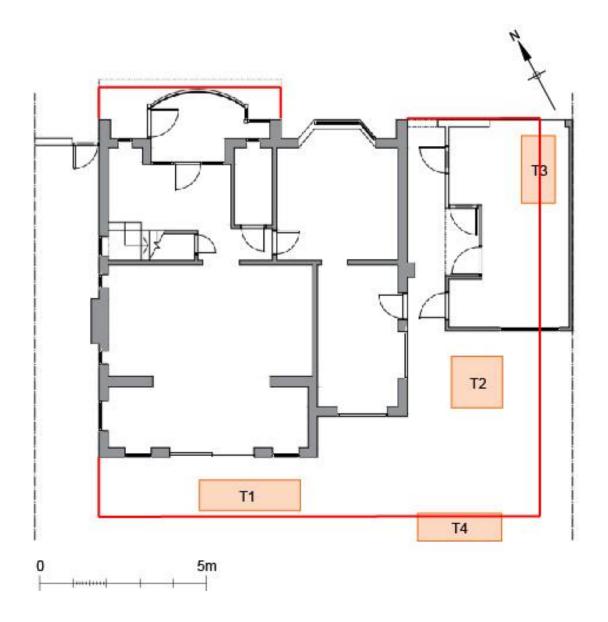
Site plan with planned extension outlined in red and archaeological trenches (orange). Adapted from drawing No. A01 and A02 by Inspired Plans Ltd.
